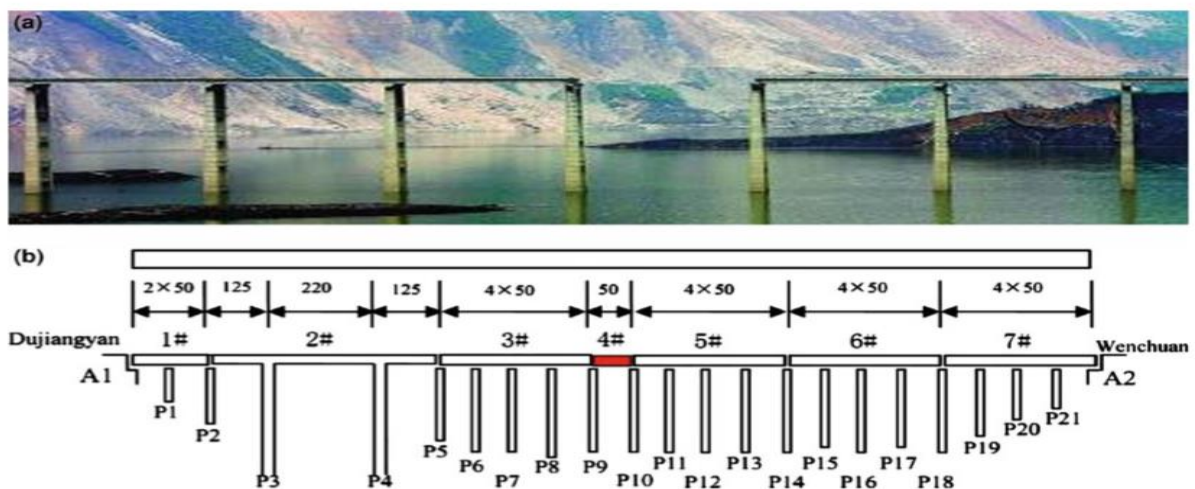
a Failure of the MPZ bridge and b Schematic drawing of the bridge during the 2008 Wenchuan earthquake (Bhattacharya et al. 2012)
